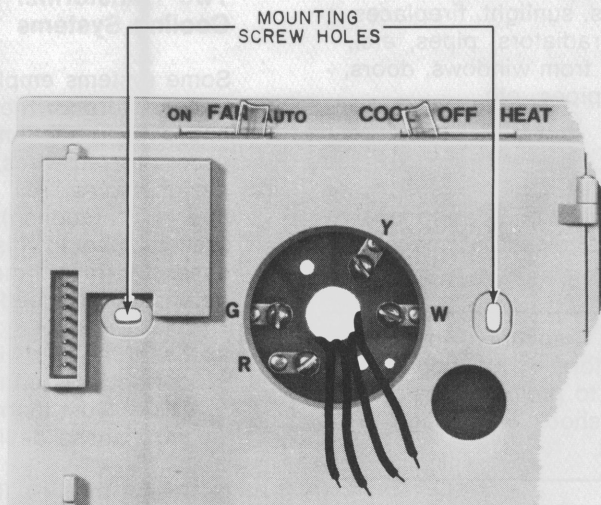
Interior view of mounting subbase. Note mounting screw holes and wiring opening.
